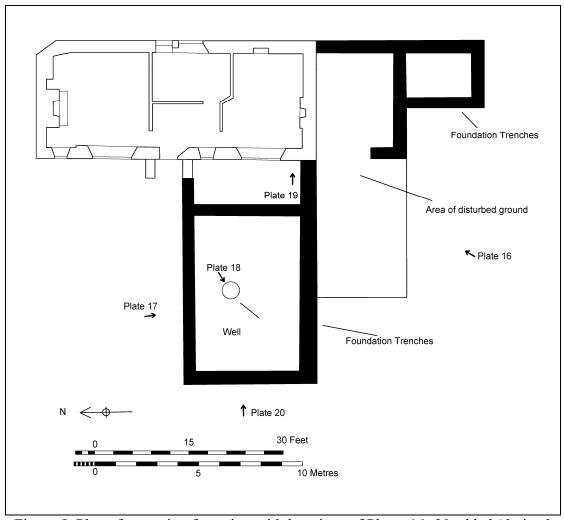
Plan of extension footprint, with locations of Plates 16- 20 added (derived from plans supplied by FWK Architects).
